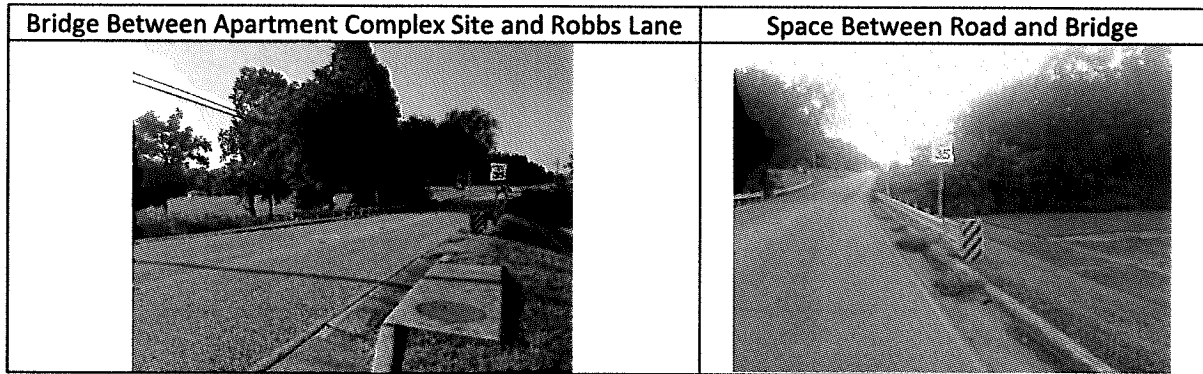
Bridge Between Apartment Complex Site and Robbs Lane
